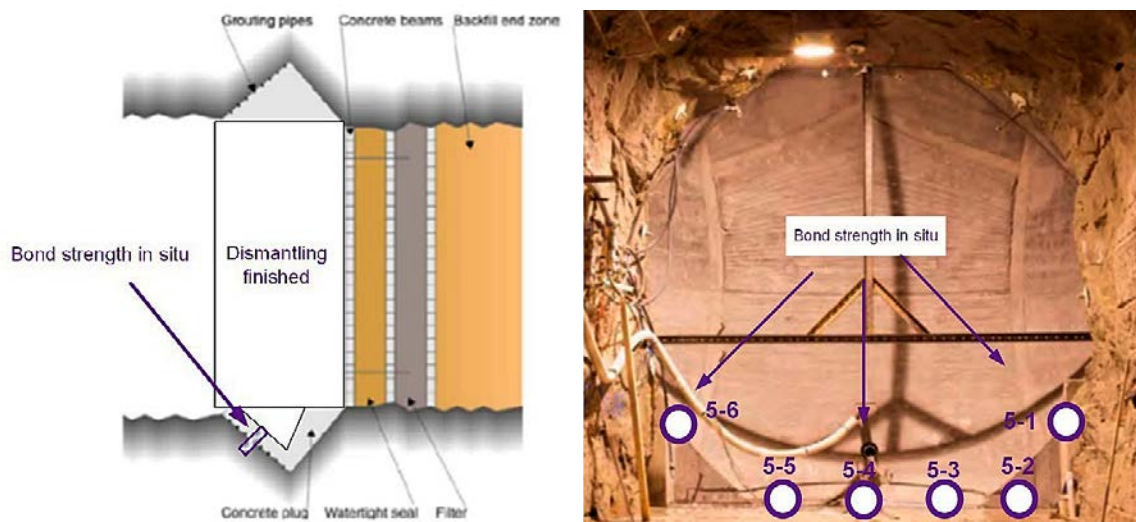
In situ test of bond strength between rock and concrete on the upstream face of the slot in the rock.
